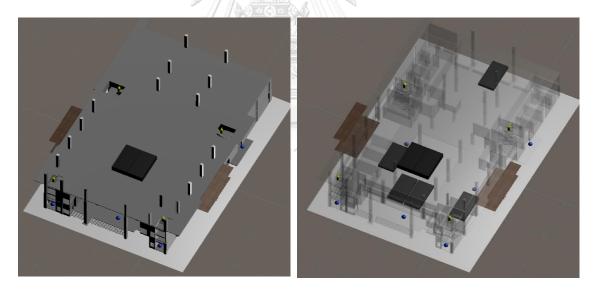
Fire extinguisher installation plan for 2nd floor of scenario 1D
